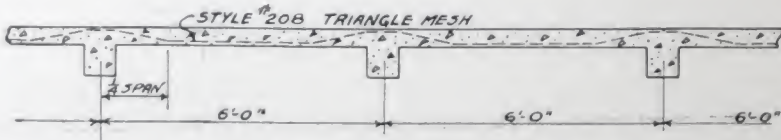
Section through beam and slabs showing typical mesh design for slabs.
